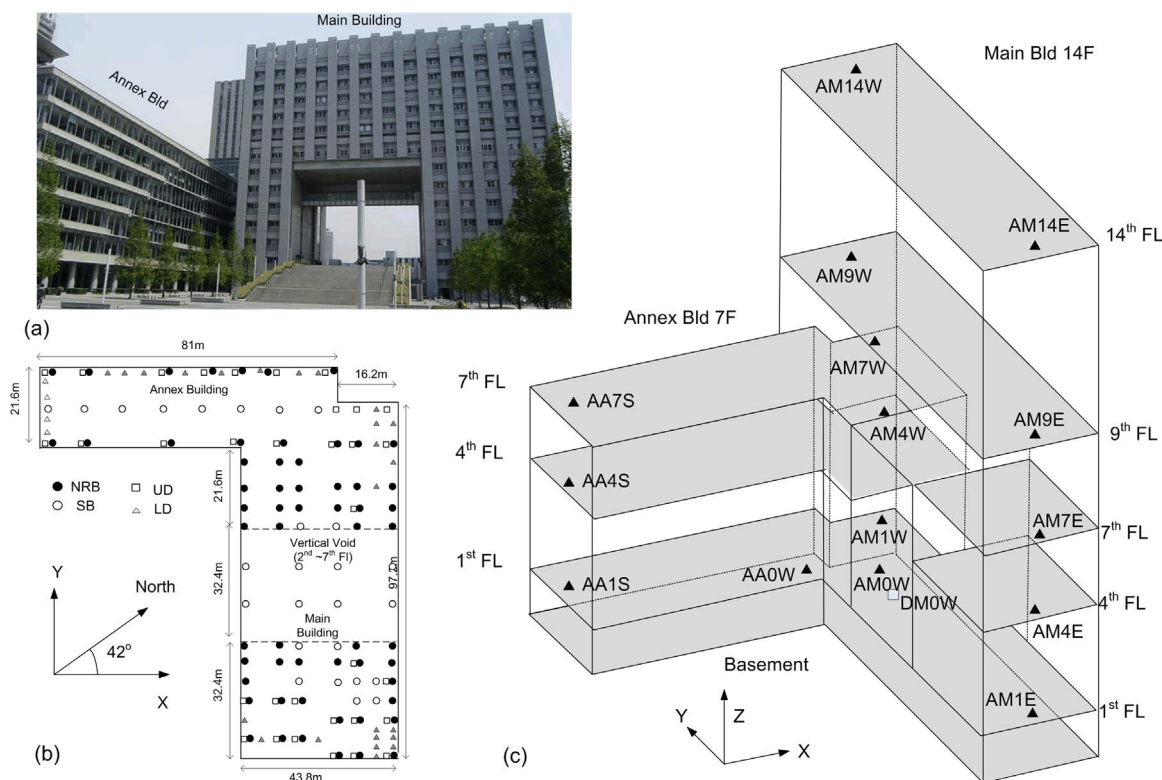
(a) Photo of SIT Building, (b) dimension, orientation and building's plan view with layout of isolators at basement level, (c) Layout and location of monitoring system (note: NRB: natural rubber bearing, SB: sliding bearing, LD: lead damper and UD: U-shaped steel dampers).
